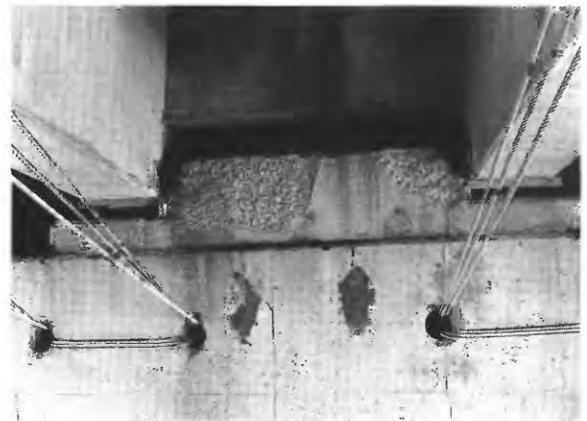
Spalling on the Span 16 side of Pier 17 at Napa River Bridge.
